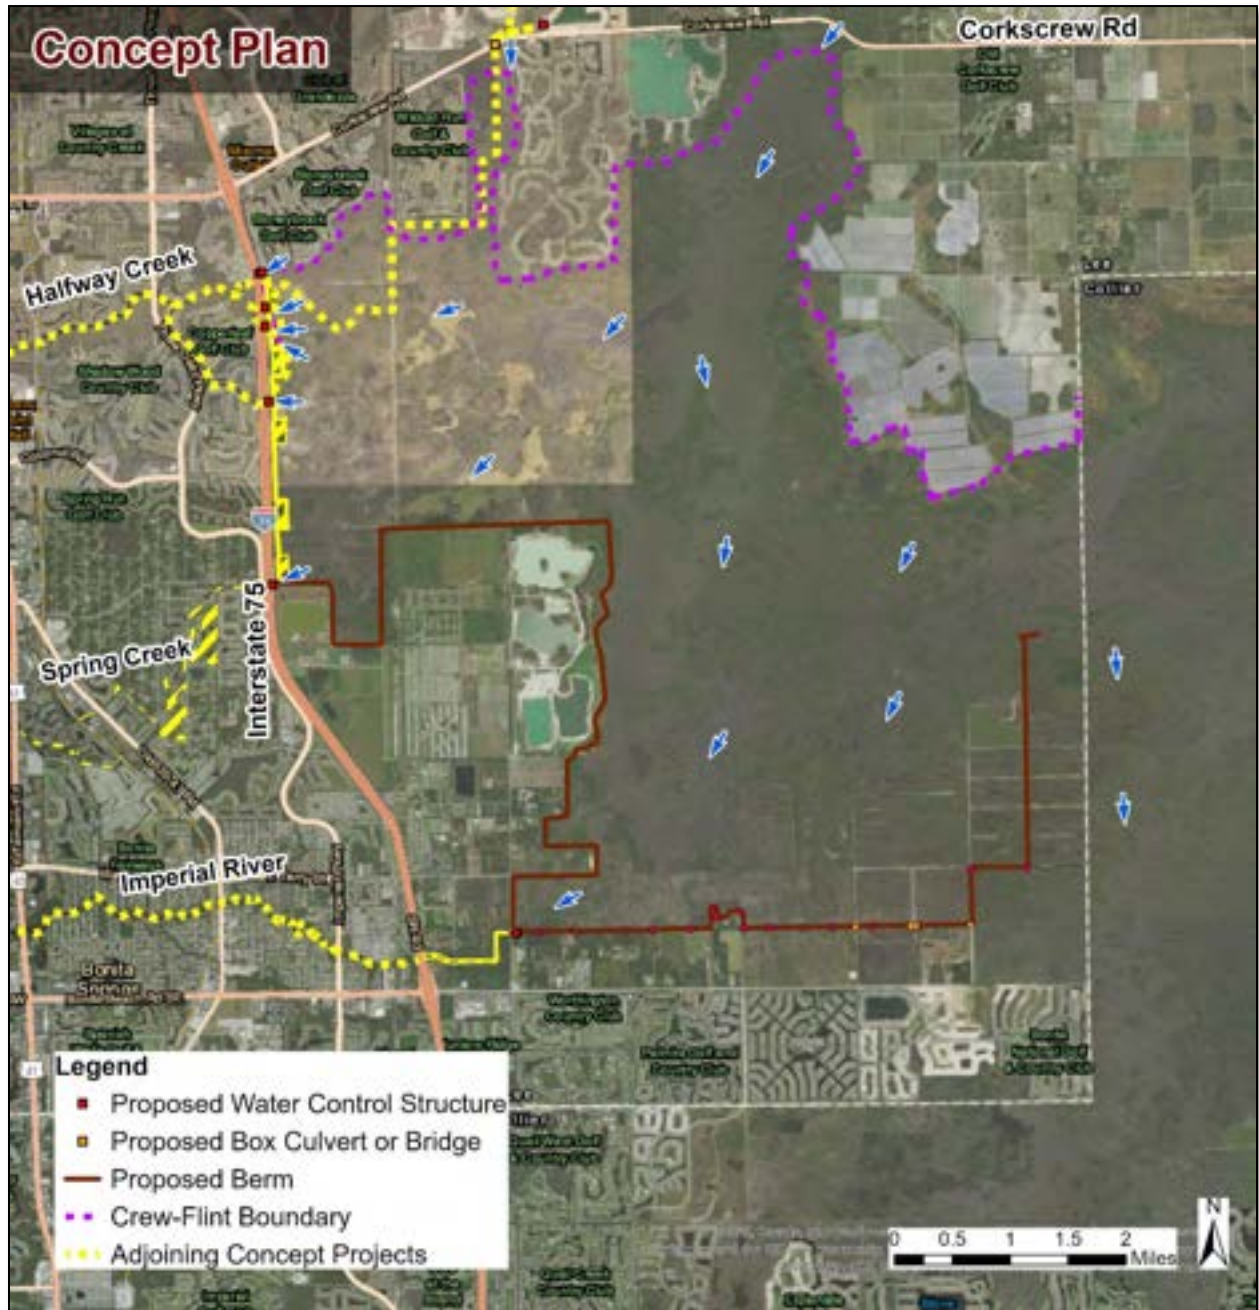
Concept Plan, Crew-Flint Pen Hydrologic Restoration
